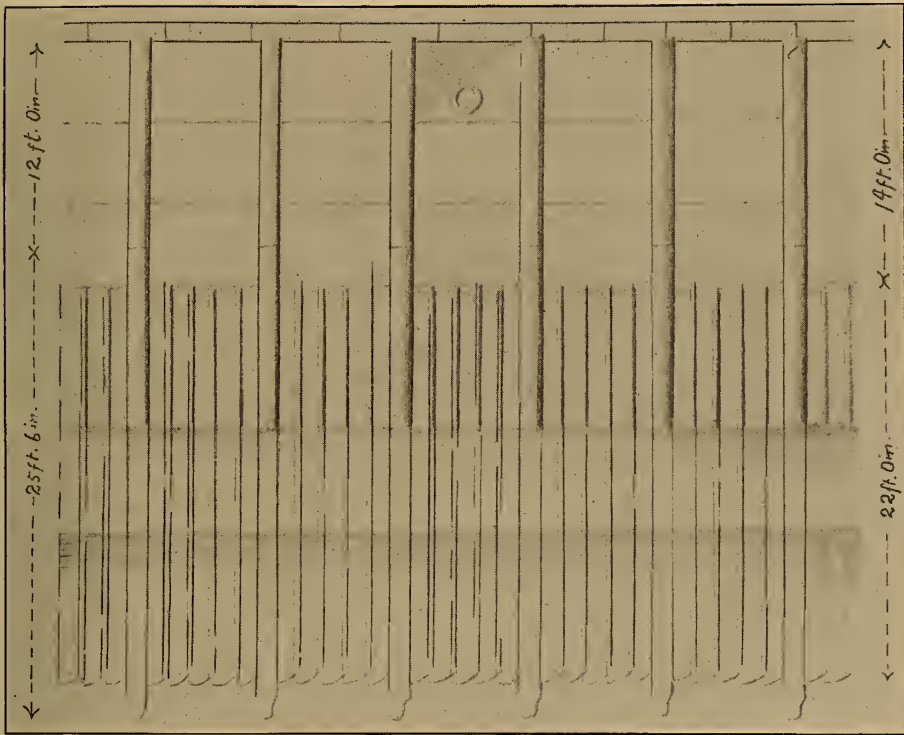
SHEET PILING CONSTRUCTION AT BRUNSWICK WHARF
